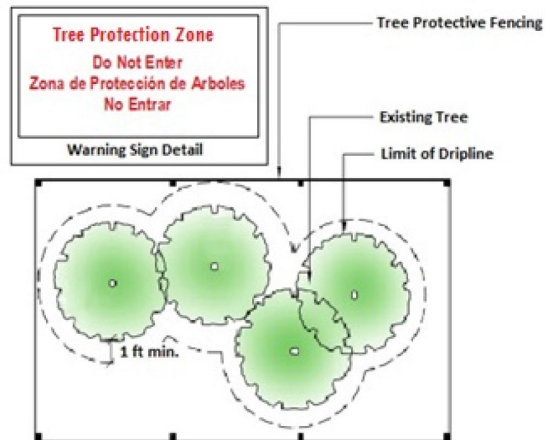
J.2: Tree Protective Fencing and Signage.
